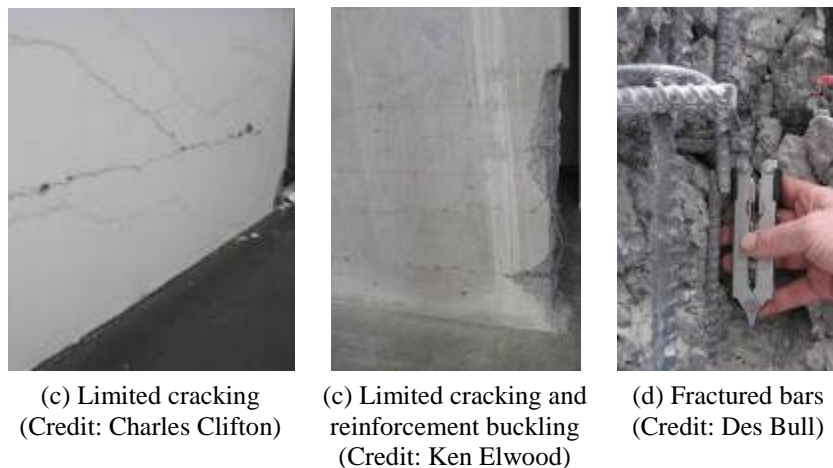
Examples of observed damage to lightly reinforced concrete walls
